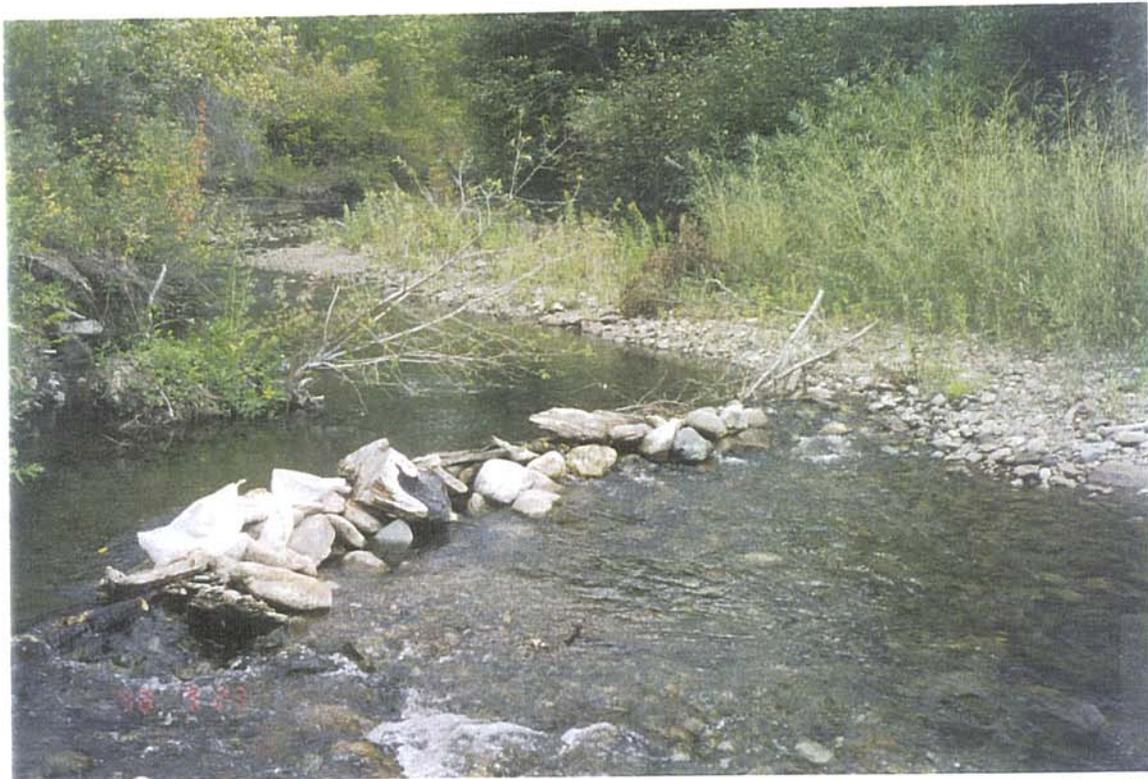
Pottery Ditch (Taos Pueblo) - Looking at rock and brush diversion that diverts flow to Pottery Ditch, on the lower left corner of photo. Reconstruction is required after every moderate spring runoff and thunderstorm. A permanent concrete diversion is recommended.
